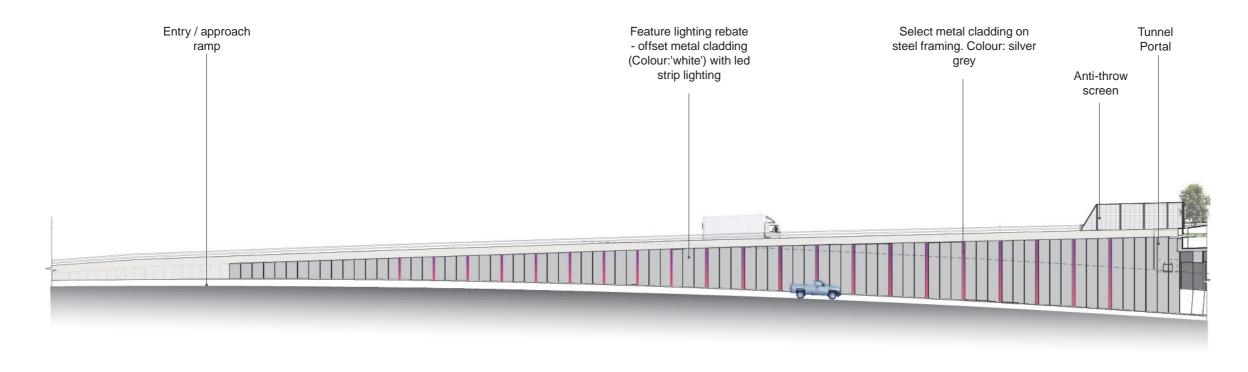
Iron Cove Link - Tunnel portal dive wall - north elevation
